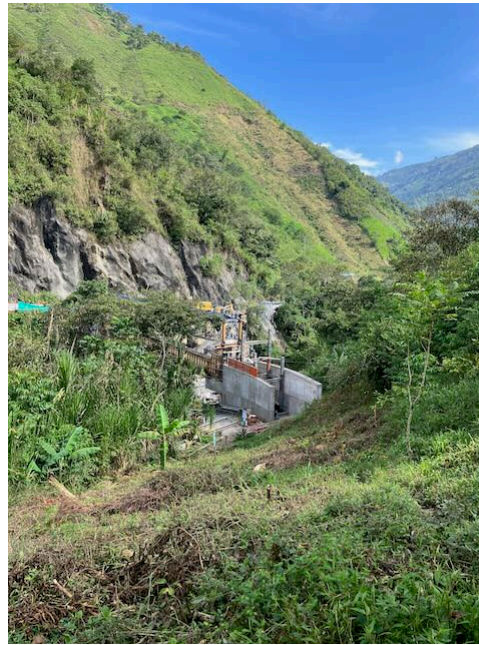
View of highway, tunnel portal and bridge construction from right bank
